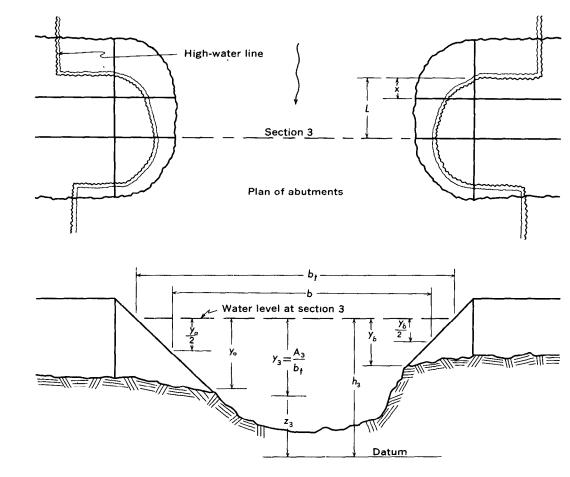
Definition sketch of type 2 opening, sloping embankments and vertical abutments.
